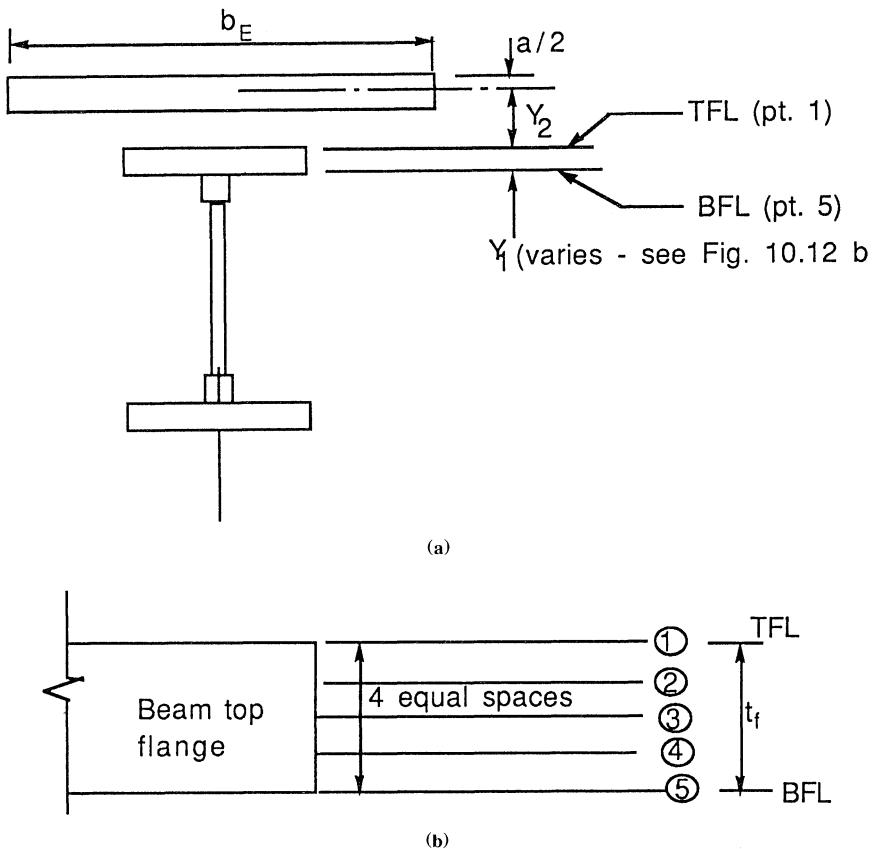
Composite sections by LRFD. (Figure 4.3 from LRFD, Manual of Steel Construction, first edition, 1986, by American Institute of Steel Construction p.5.)
